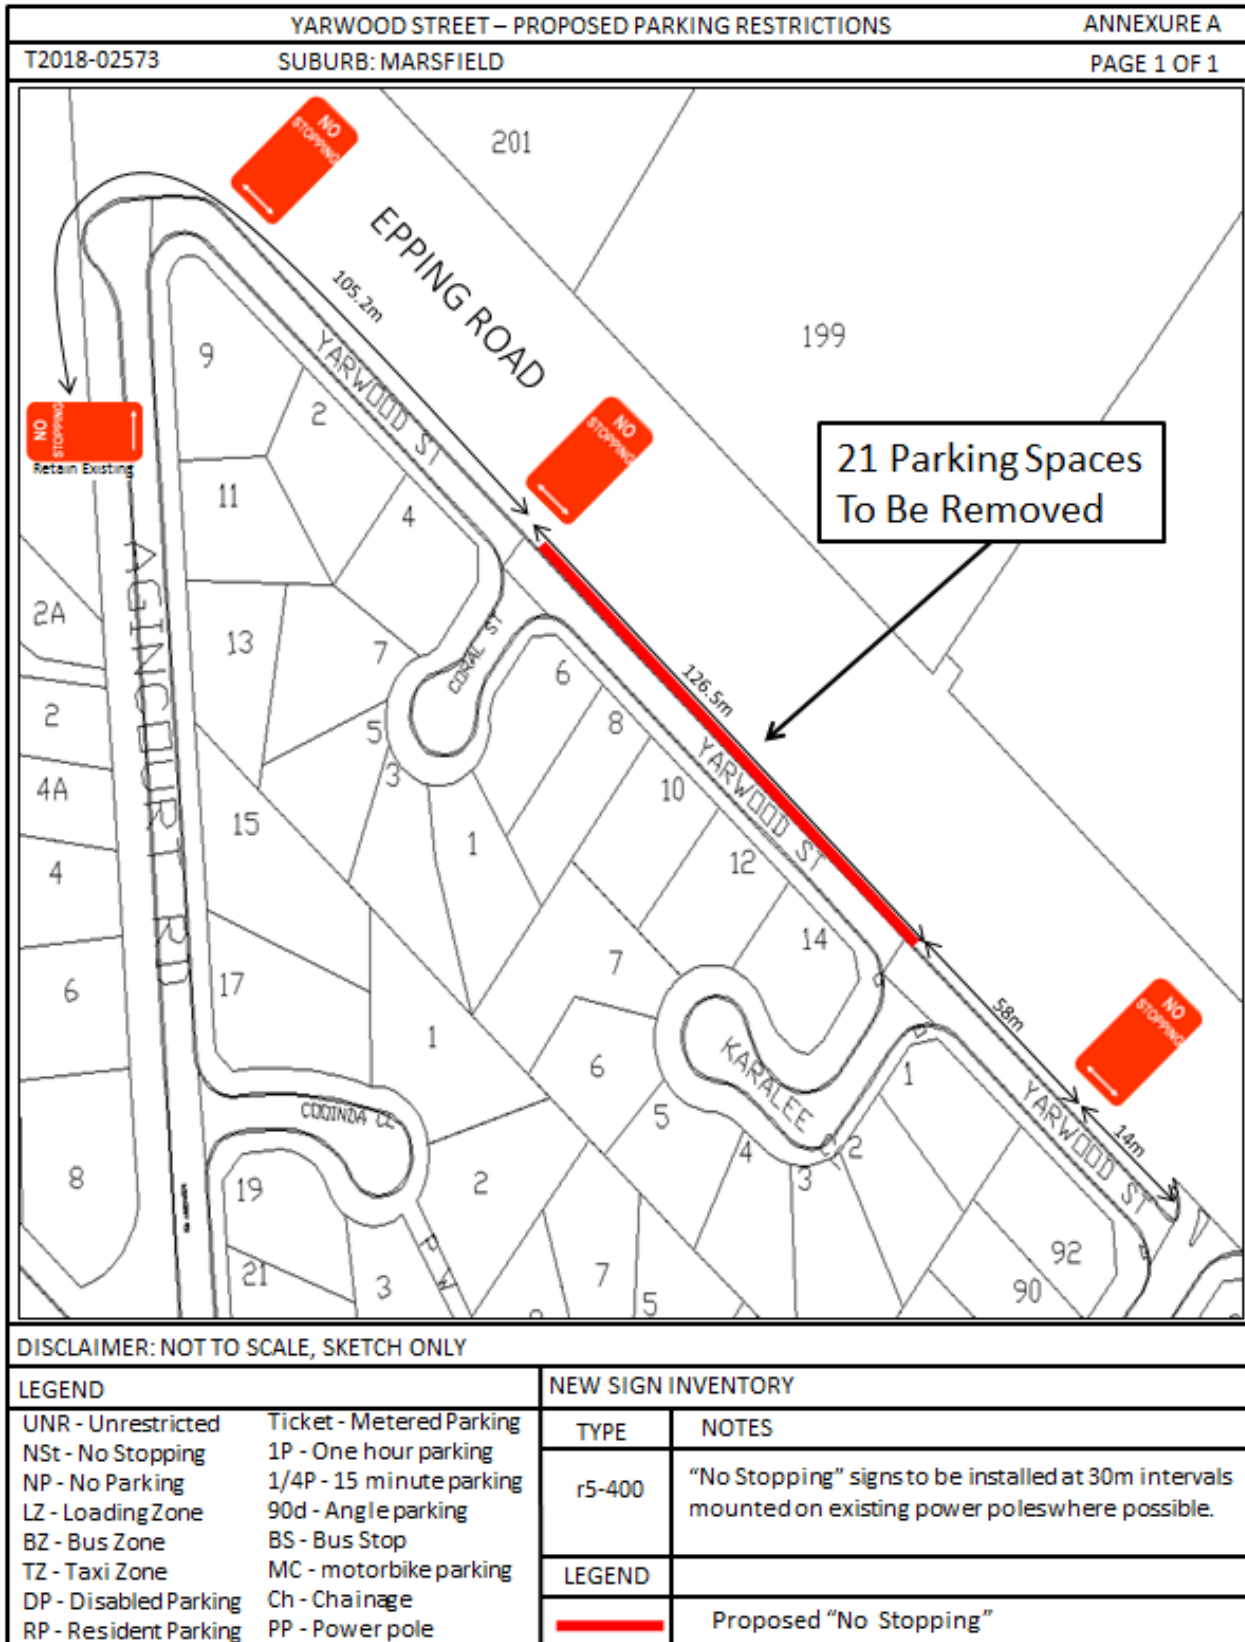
Proposed "No Stopping" on the northern side of Yarwood Street, between Karalee Close and Coral Street
